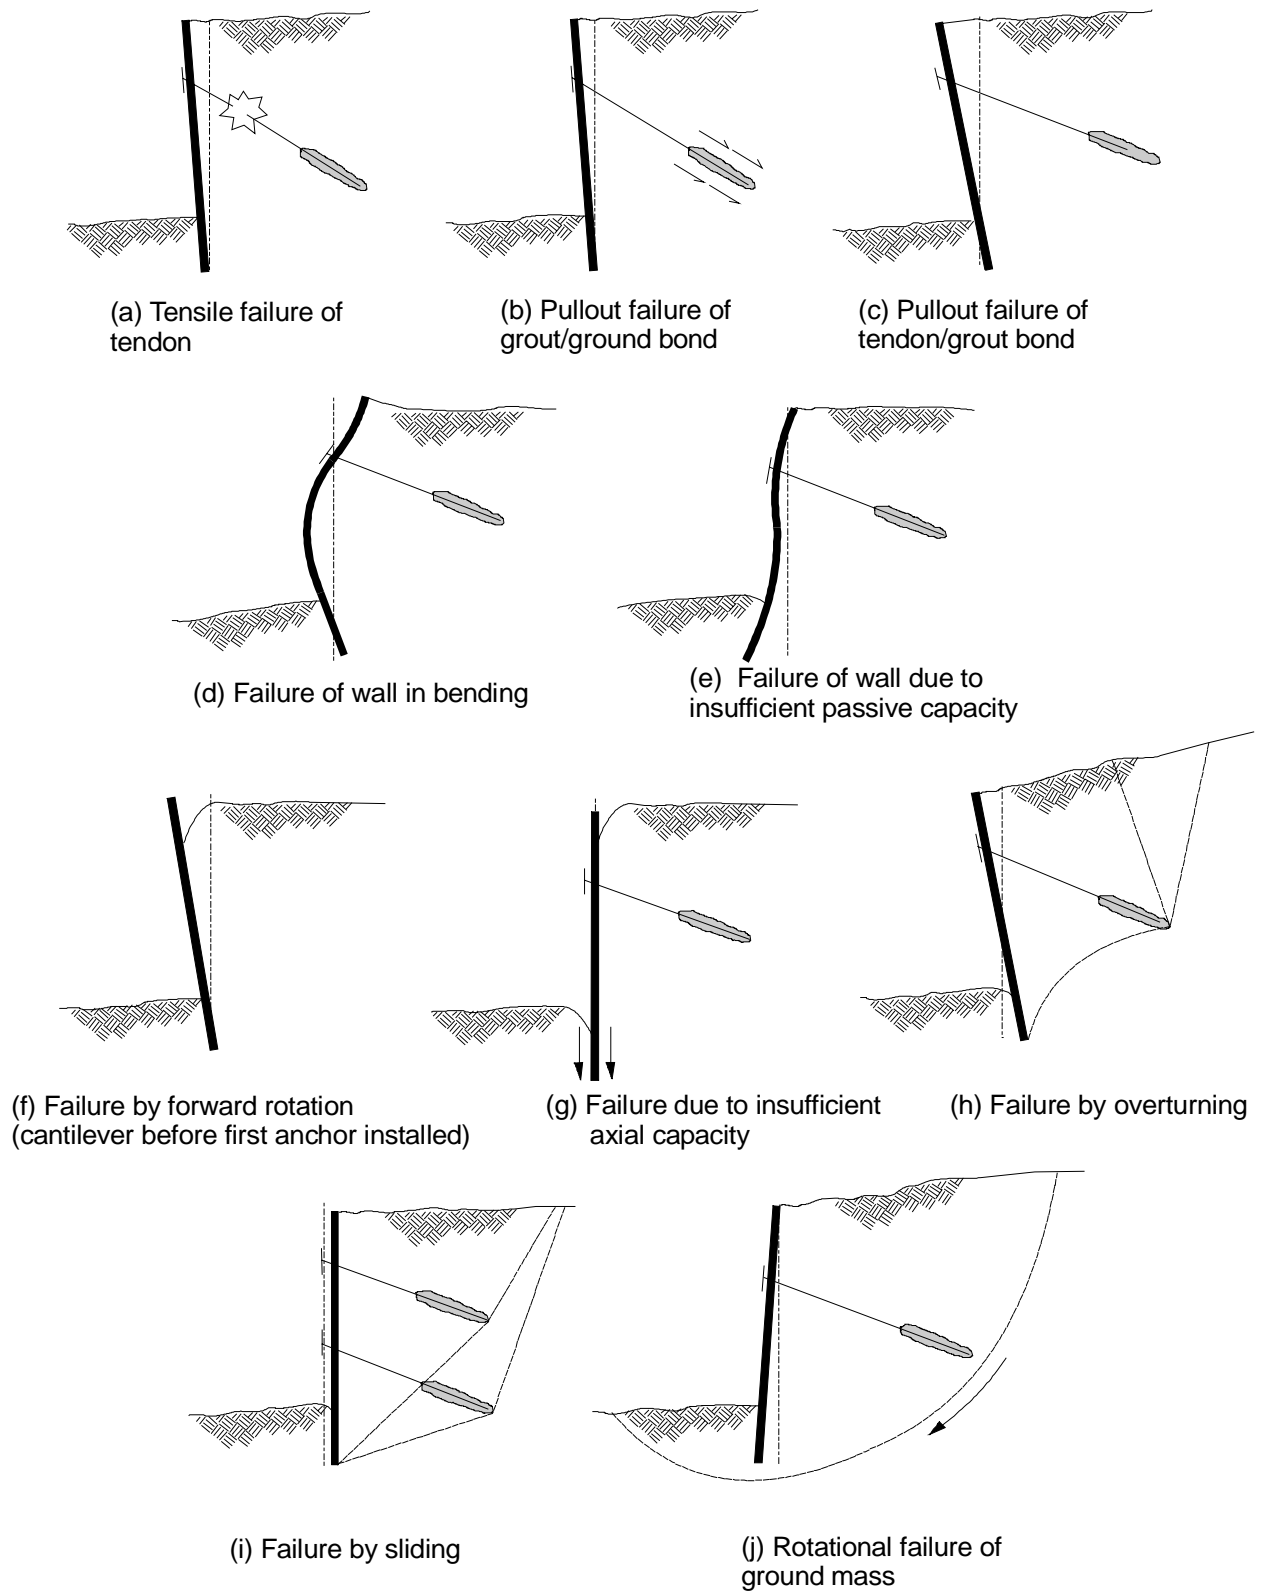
Potential failure conditions to be considered in design of anchored walls.
